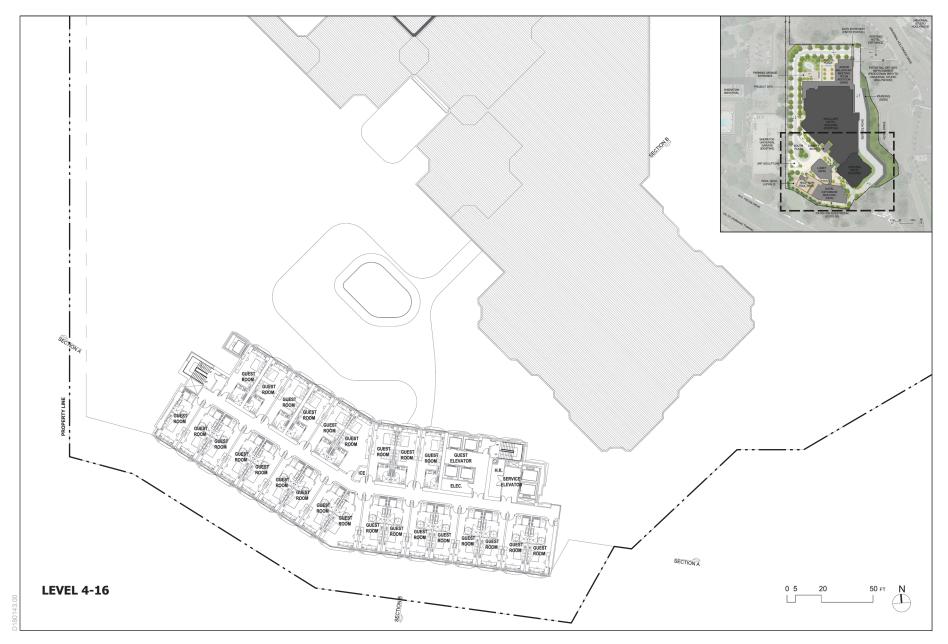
Level 4-16 Typical Layout (South) – Hotel Expansion Building
